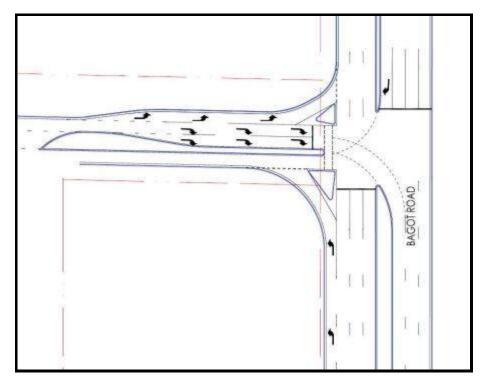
Bagot Road – Internal Road Signalised Intersection (Source Citiland DA)
